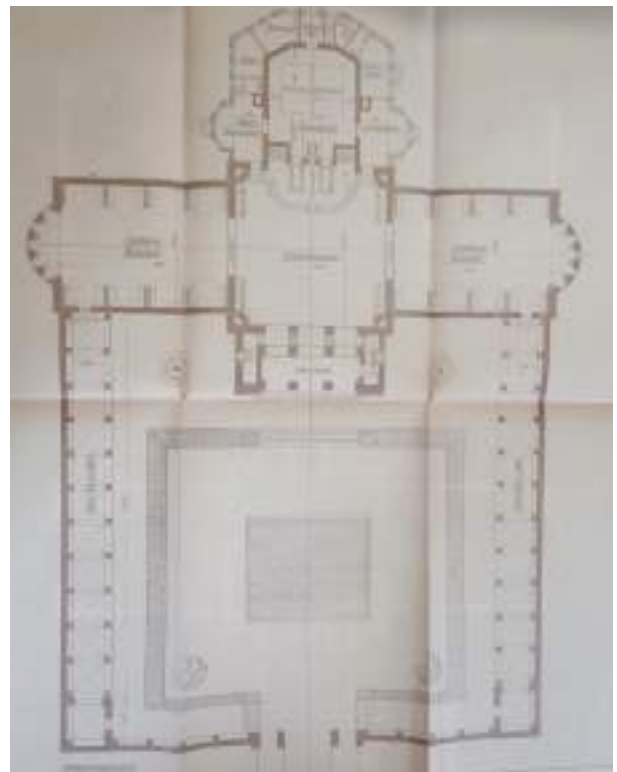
New Crematory Floor Plan. Archive Stadt Zurich (1915). [Plan]
